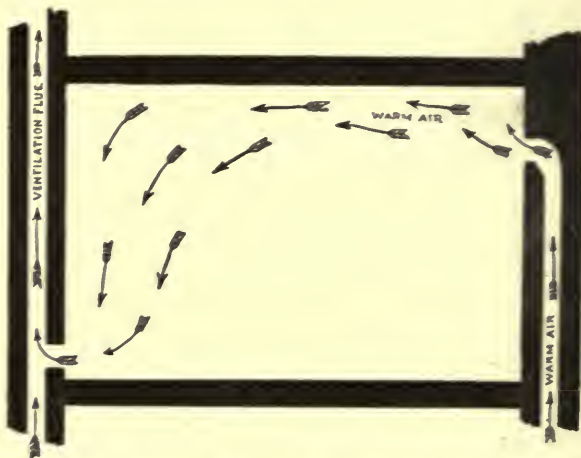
GRAVITY SYSTEM, WITH INLET HIGH AND OUTLET NEAR THE FLOOR ON THE OPPOSITE SIDE.
